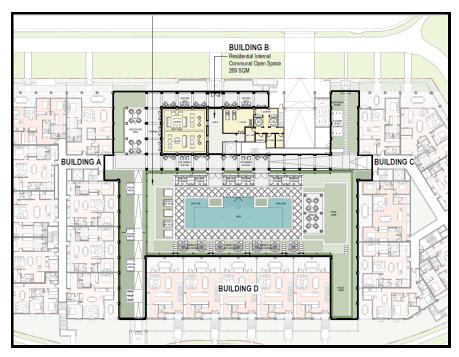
Proposed communal open space (Source: Plan DA325, Conrad Gargett, August
